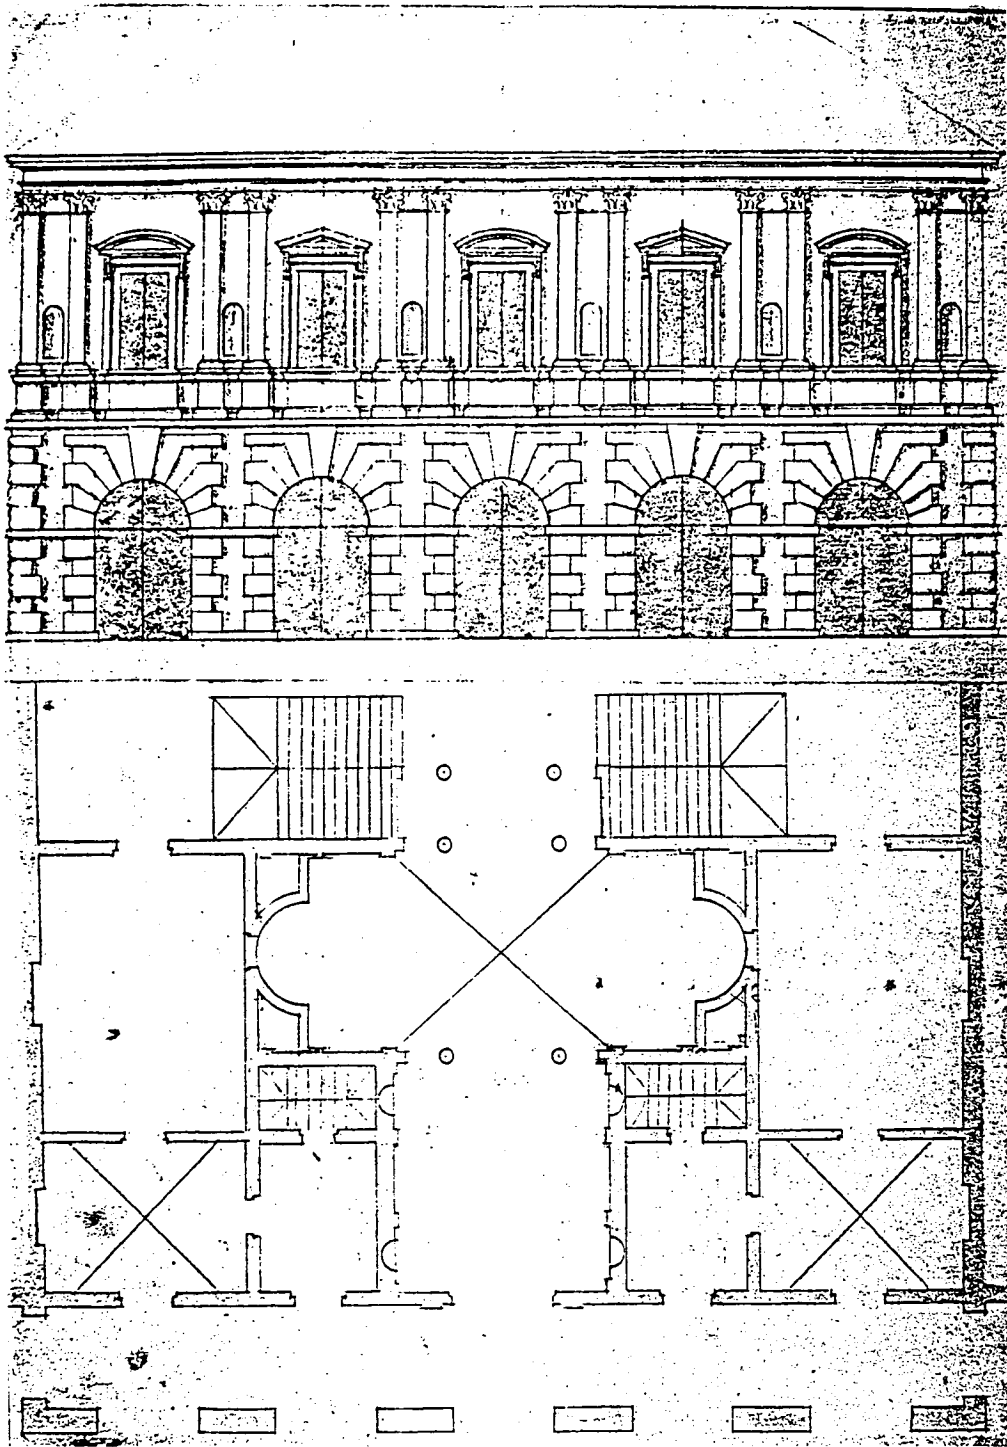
Andrea Palladio: facade and plan for Palazzo Civena (RIBA XVII/14)
